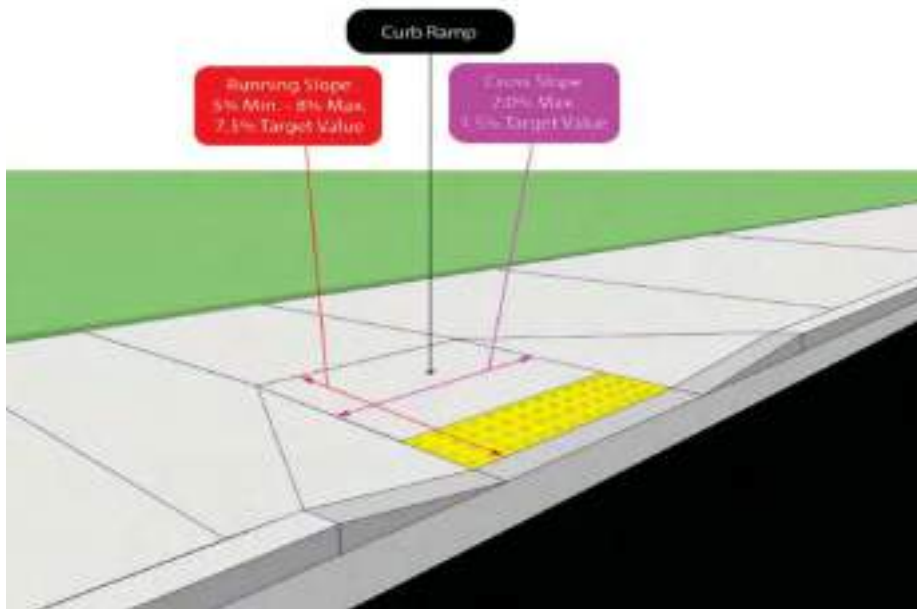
Dimensions of sidewalk slope for accessible crosswalks
